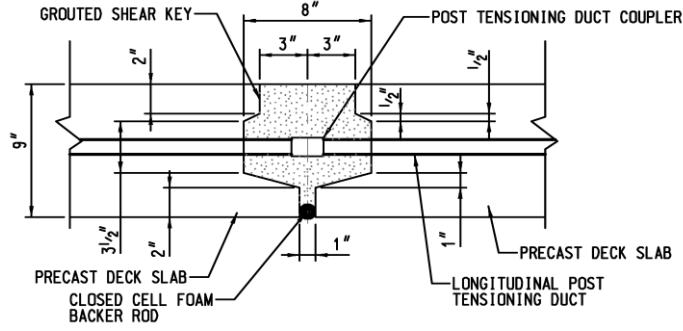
Transverse Joint Detail with Post-Tensioning³
